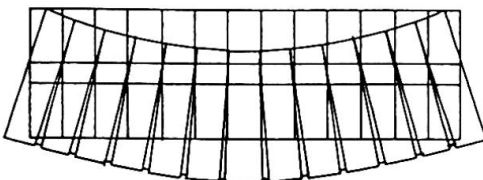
Deflection of floor with unbonded tendon fixed at columns
